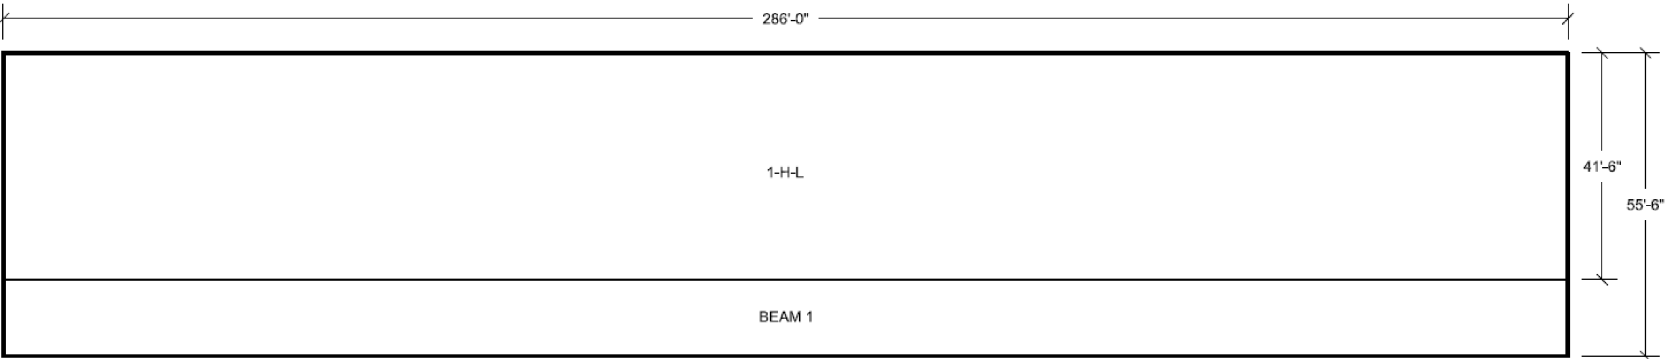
H.6-110 Cooling Tower North (and South) Wall Looking South (North)
